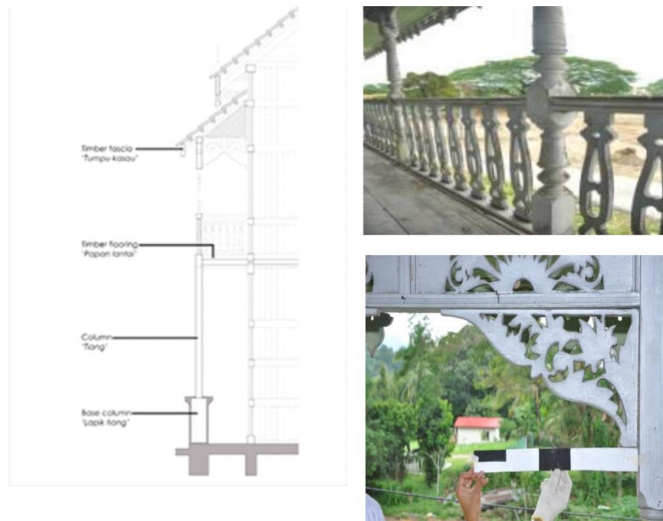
Elevation of a column at the portico (left), Carved bracket and balustrades at the portico (right)
